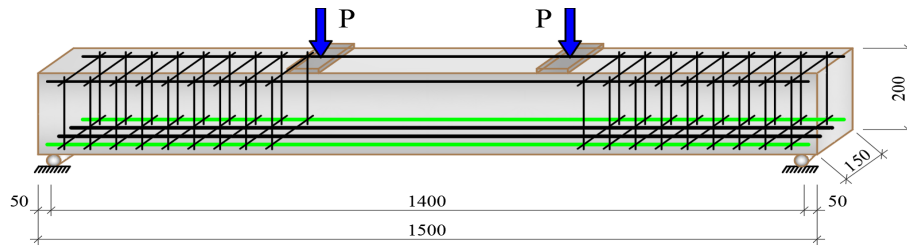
Beam geometry and reinforcement layout (B5-2S12-2F12).
